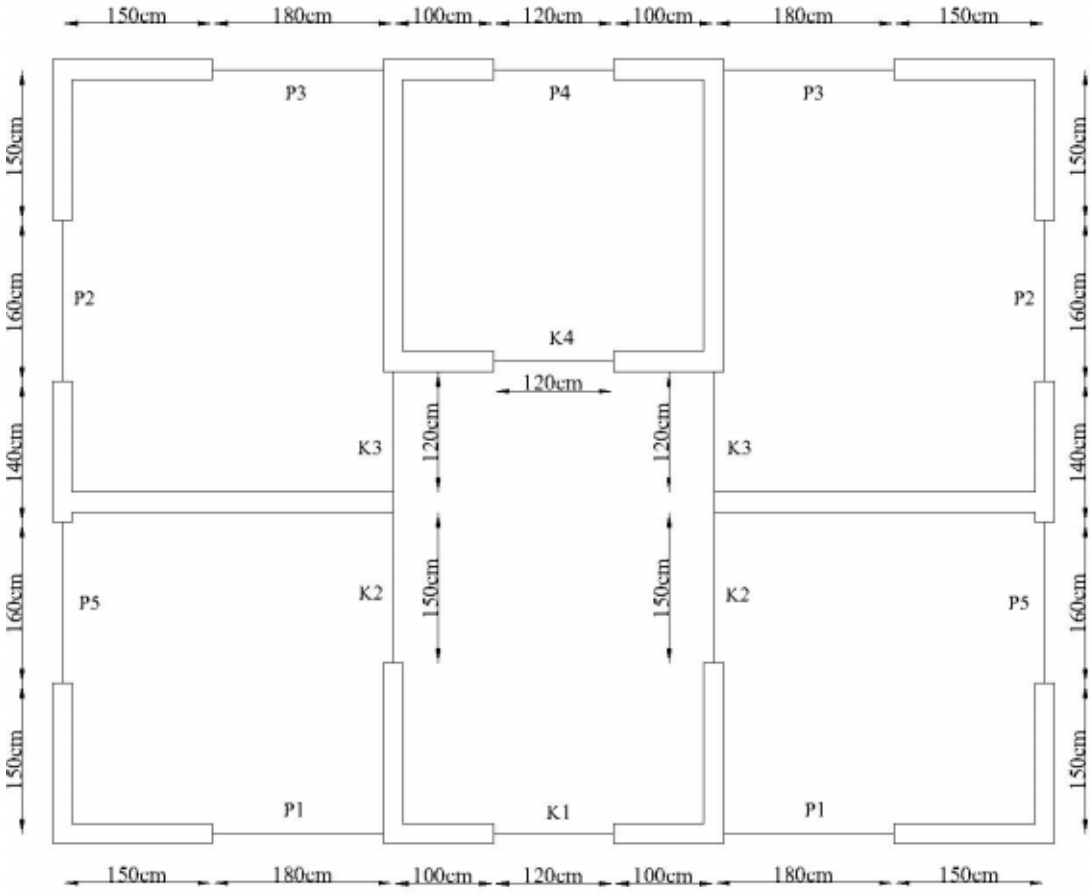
1. Plan geometry of subclass R1W2 of masonry building model
